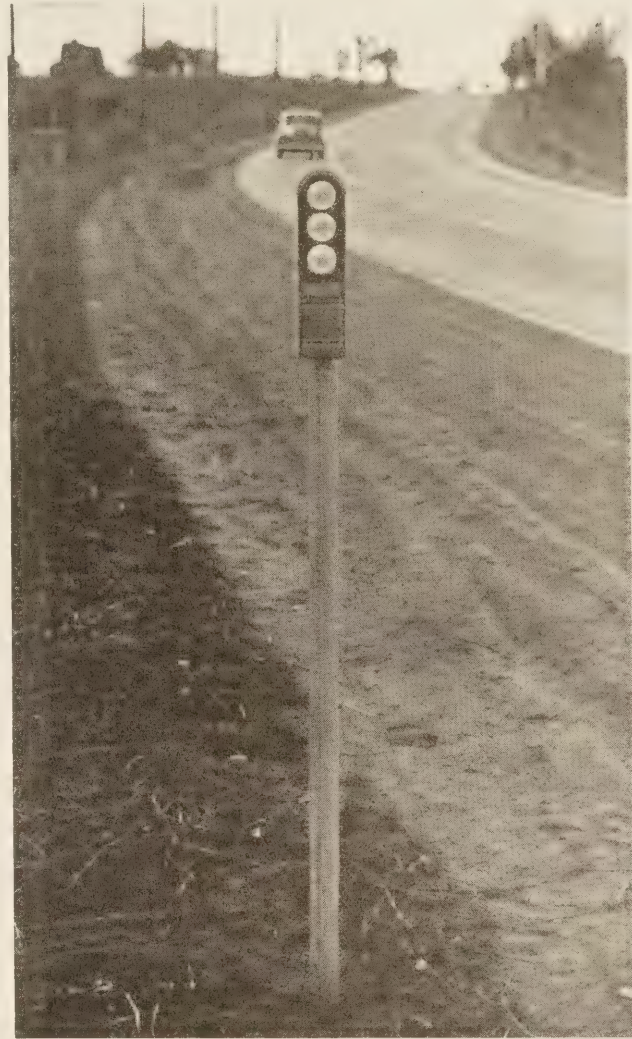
A REFLECTOR UNIT AS INSTALLED ON U S 16 BETWEEN LANSING AND DETROIT, MICHIGAN.
